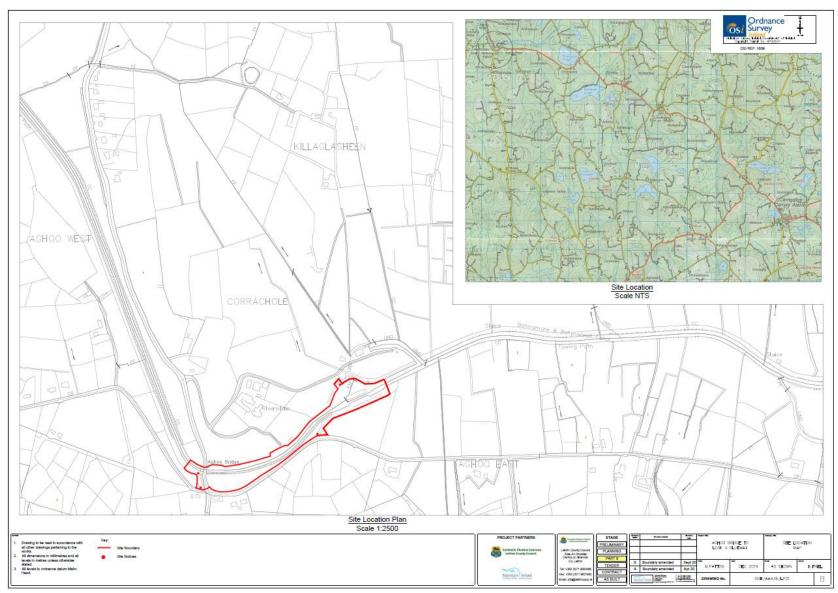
Location of the proposed Aghoo Bridge Blueway project.
